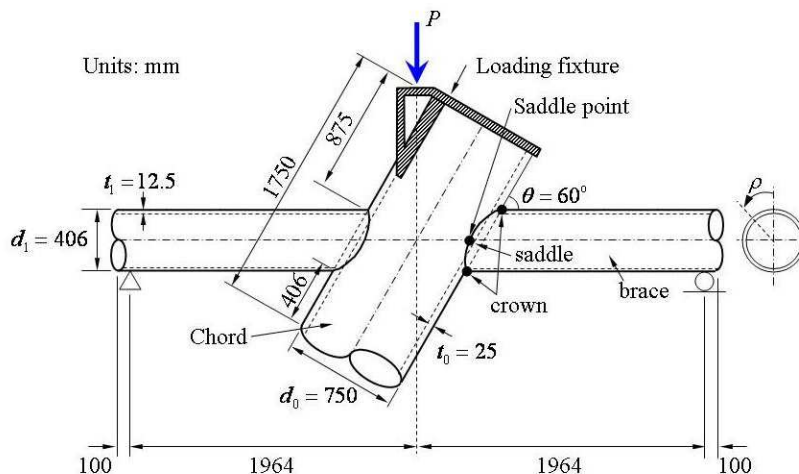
Geometric configuration of the circular hollow section X-joint fabricated from the enhanced partial joint penetration welds
